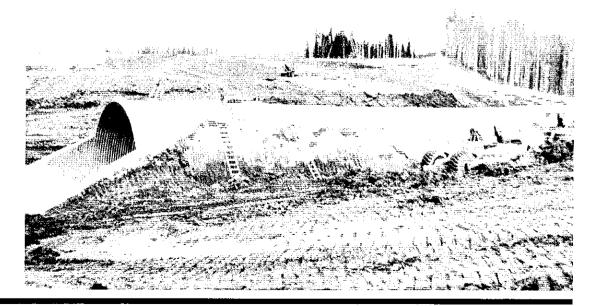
Bald Mountain Creek culvert - excavation of clay backfill prior to placing granular backfill.
